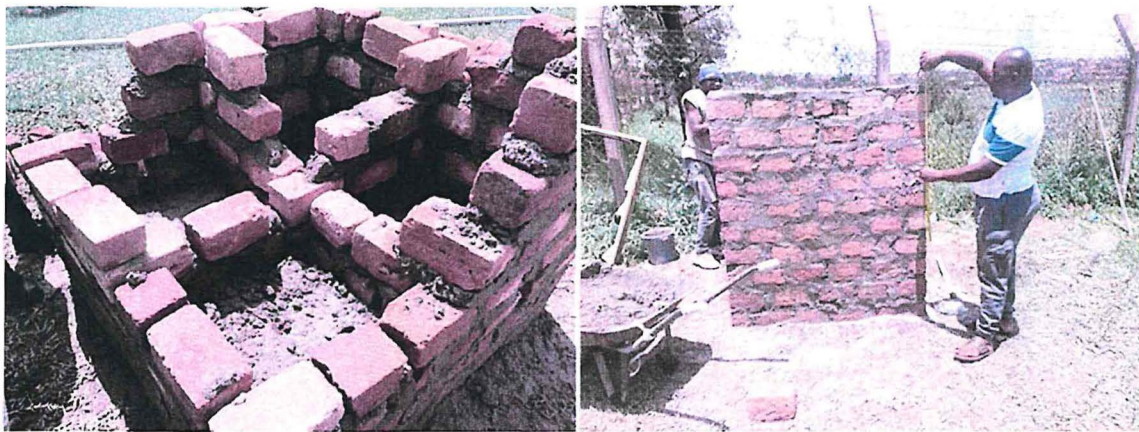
Views of the pilot-scale FS drying beds showing their construction details.
